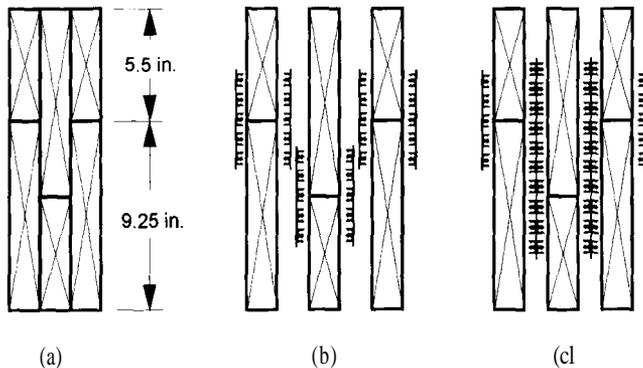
Built-up lumber girder showing (a) member lay-up, (b) metal plate connectors (MPCs), and (c) inner MPCs replaced with shear transfer plates (STPs).
